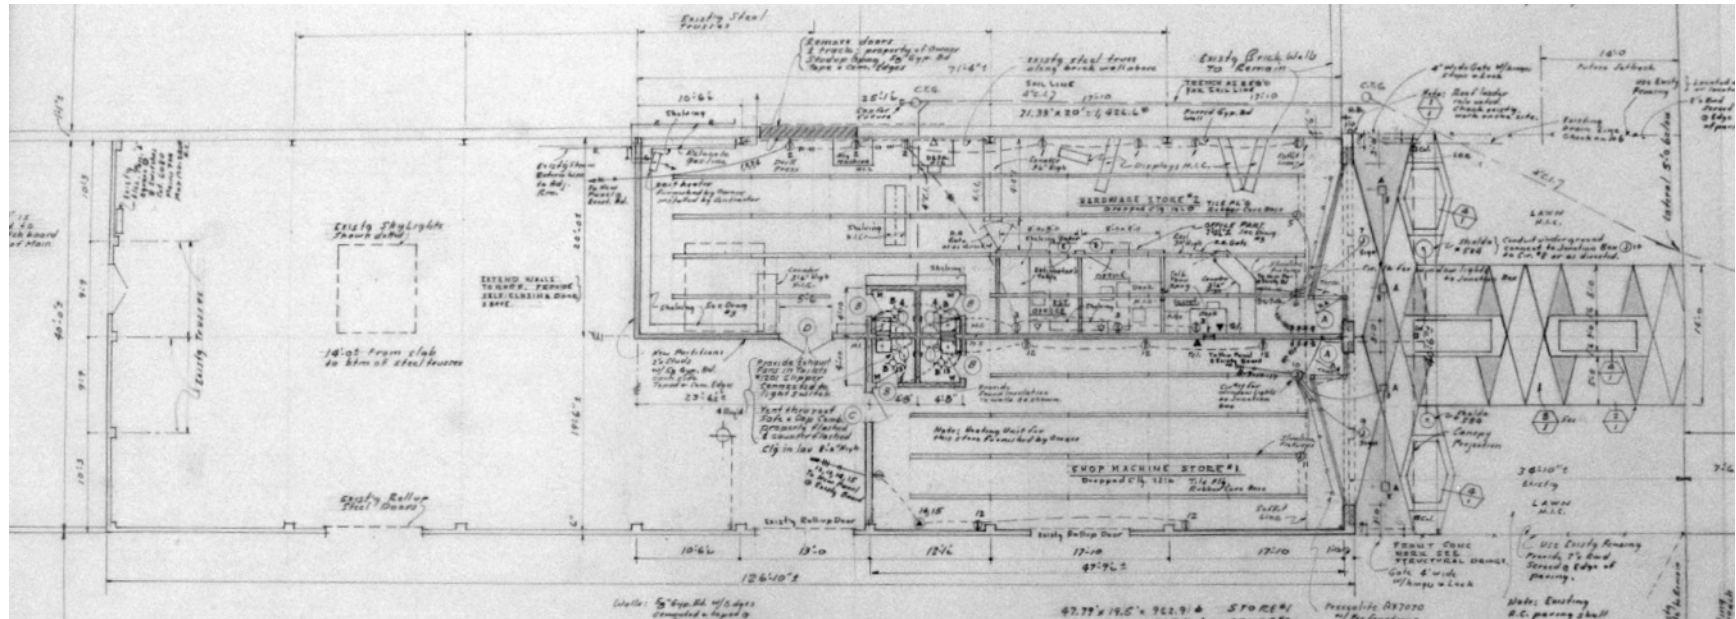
Floor plan showing 1960s renovations, Peter Wuss, Architect, December 29, 1960. Note addition of internal partitions and openings in the west facade.
